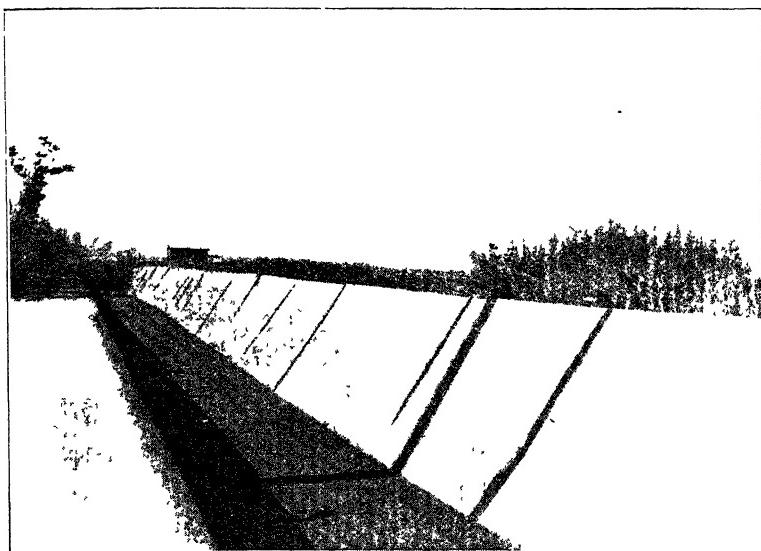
Concrete Canal with Sloping Sides for Carrying Pumped Water in Kansas
